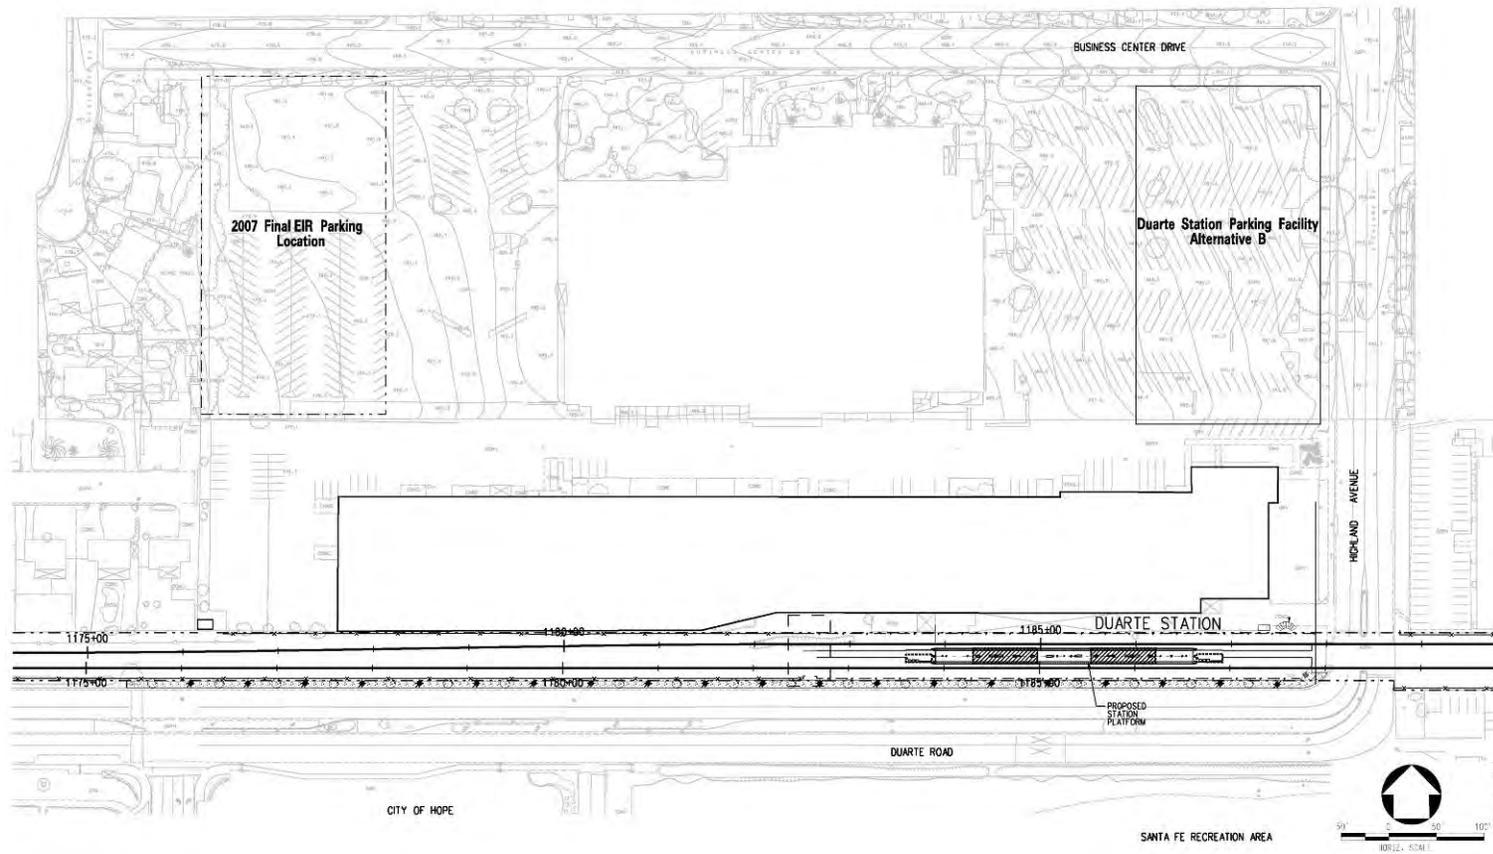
Duarte Station Parking Facility (Alternative B)
